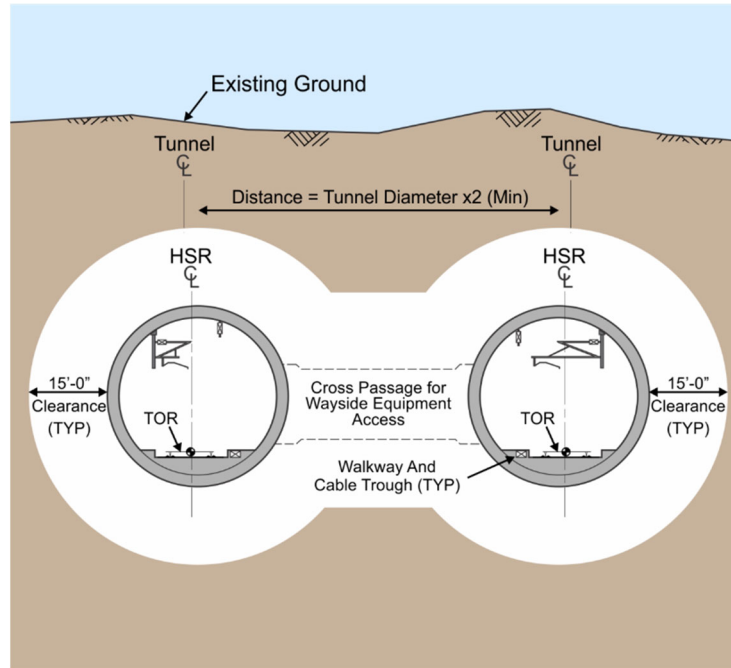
Dual-Bore Tunnel Typical Cross Section
